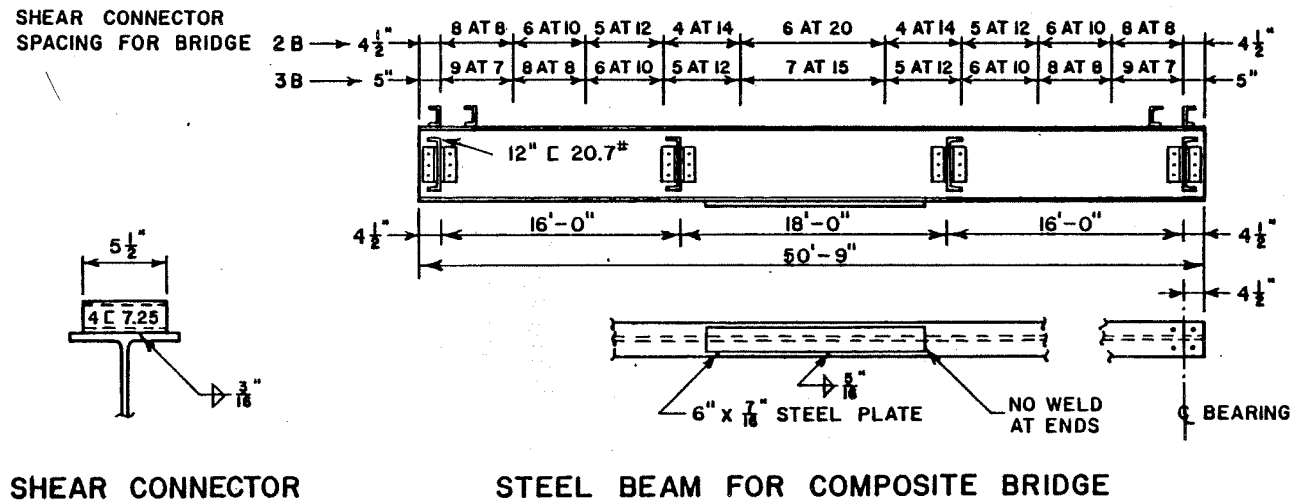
Beam Elevation, Example No. 1 (AASHTO Bridge 3B)
